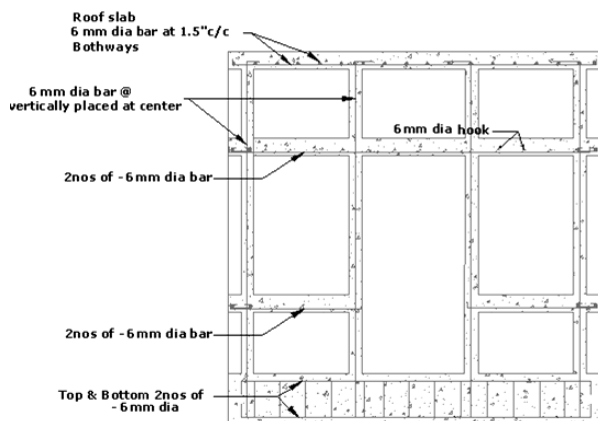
Reinforcement Details of Horizontal and Vertical Ties
